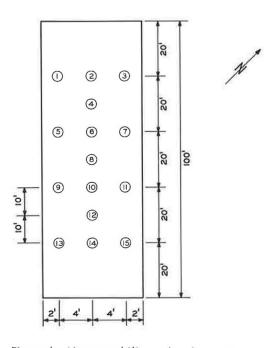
Air permeability and coring pattern on typical Moraga test section.
